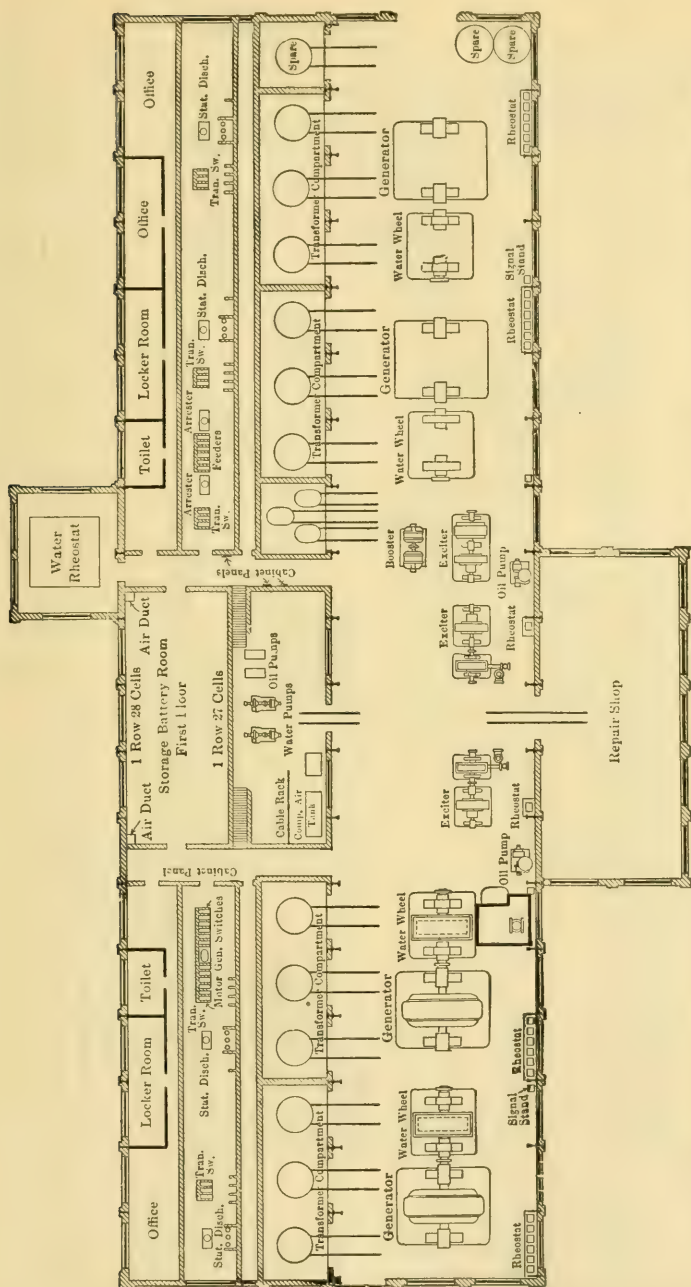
A.—Typical Hydro-Electric Power-house Arrangement. Main Floor Plan. (For cross-section see Fig. 99.)
